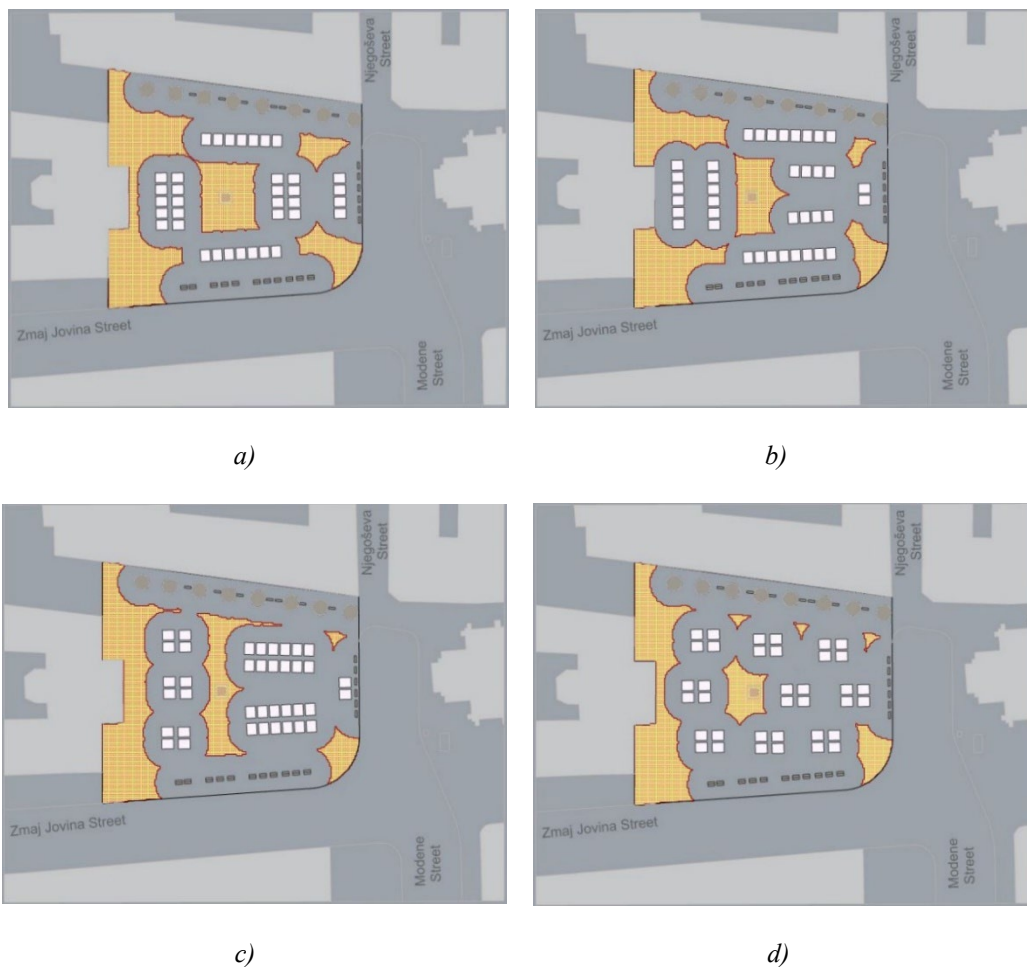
Display of the spatial configurations of standing areas for the following layouts of temporary structures: a) Layout 1 b) Layout 2 c) Layout 3 d) Layout 4
